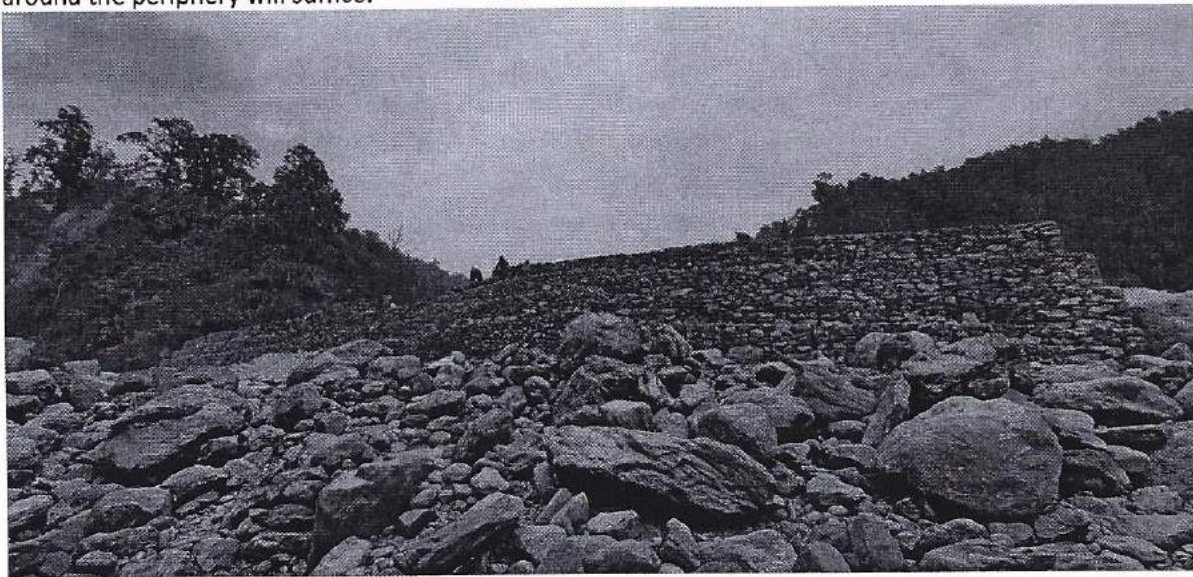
Erected Gabion wall surrounding the periphery of muck disposal site
